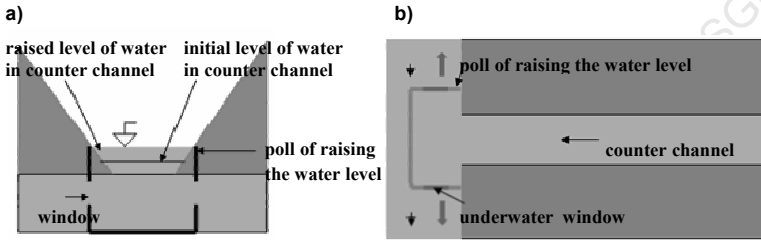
Sill planning scheme a) cross section, b) longitudinal section
